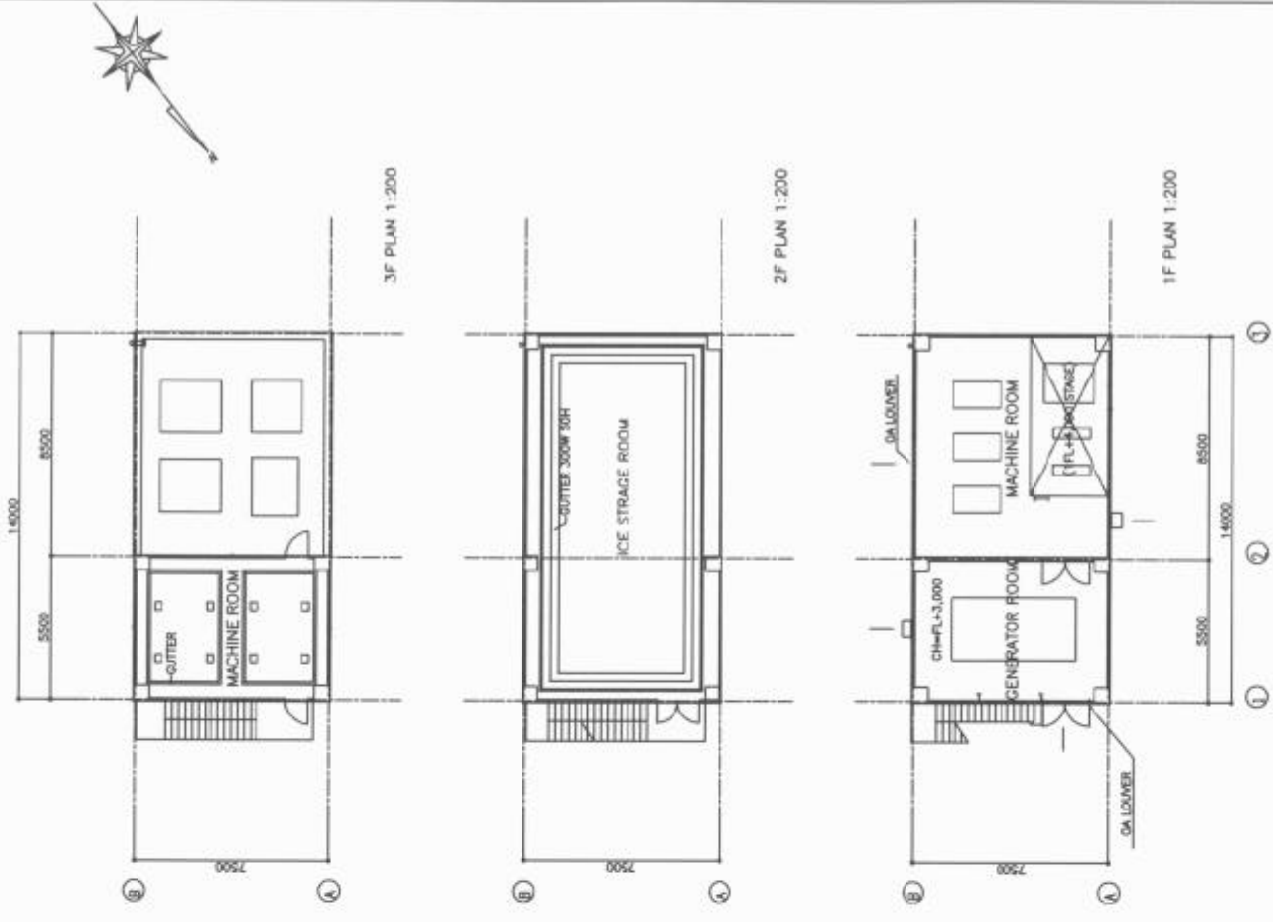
Plan of Ice-Making Facility Building
